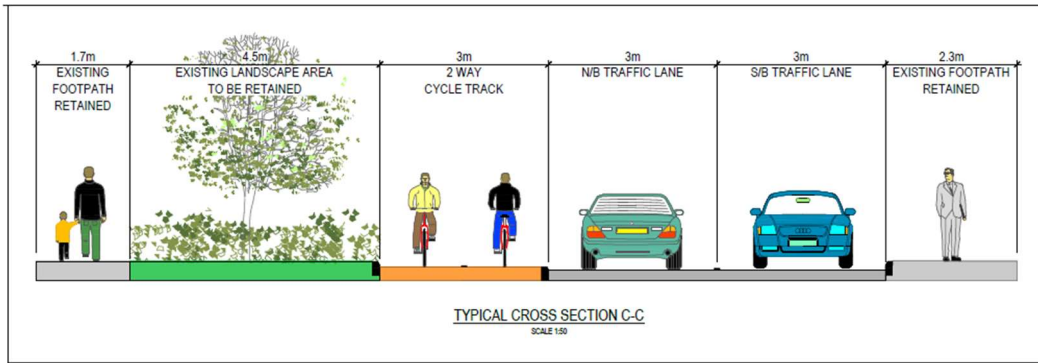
Typical cross section for Deansgrange Road at northern side of scheme
